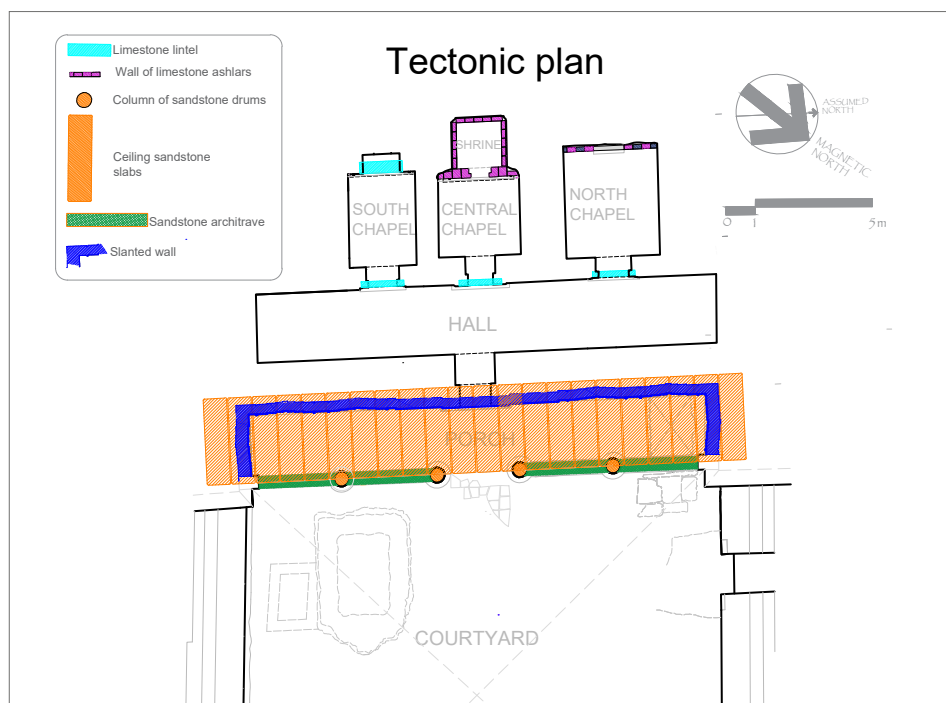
Tectonic plan showing the different pre-carved stone structural elements, used inside the inner spaces of TT 39 (Drawing M. Villarruel 2024)
